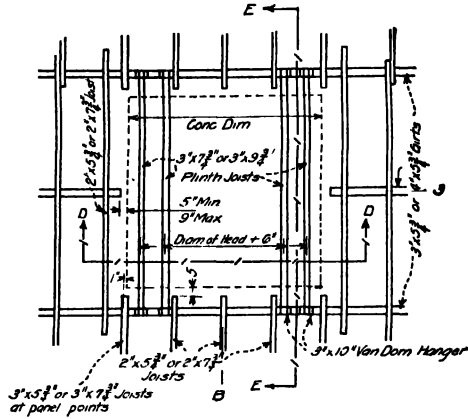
Assembly plan—drop panel—flat slab floor.
